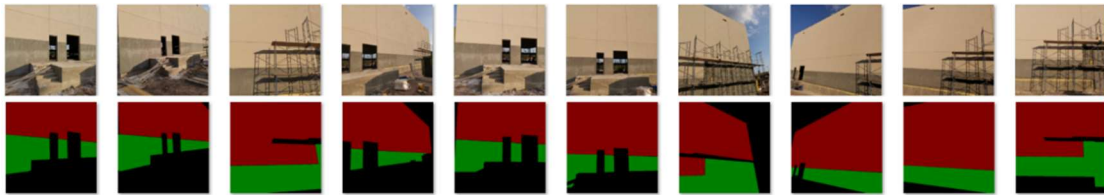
Training images and corresponding labeled images for cement brick wall and external wall
